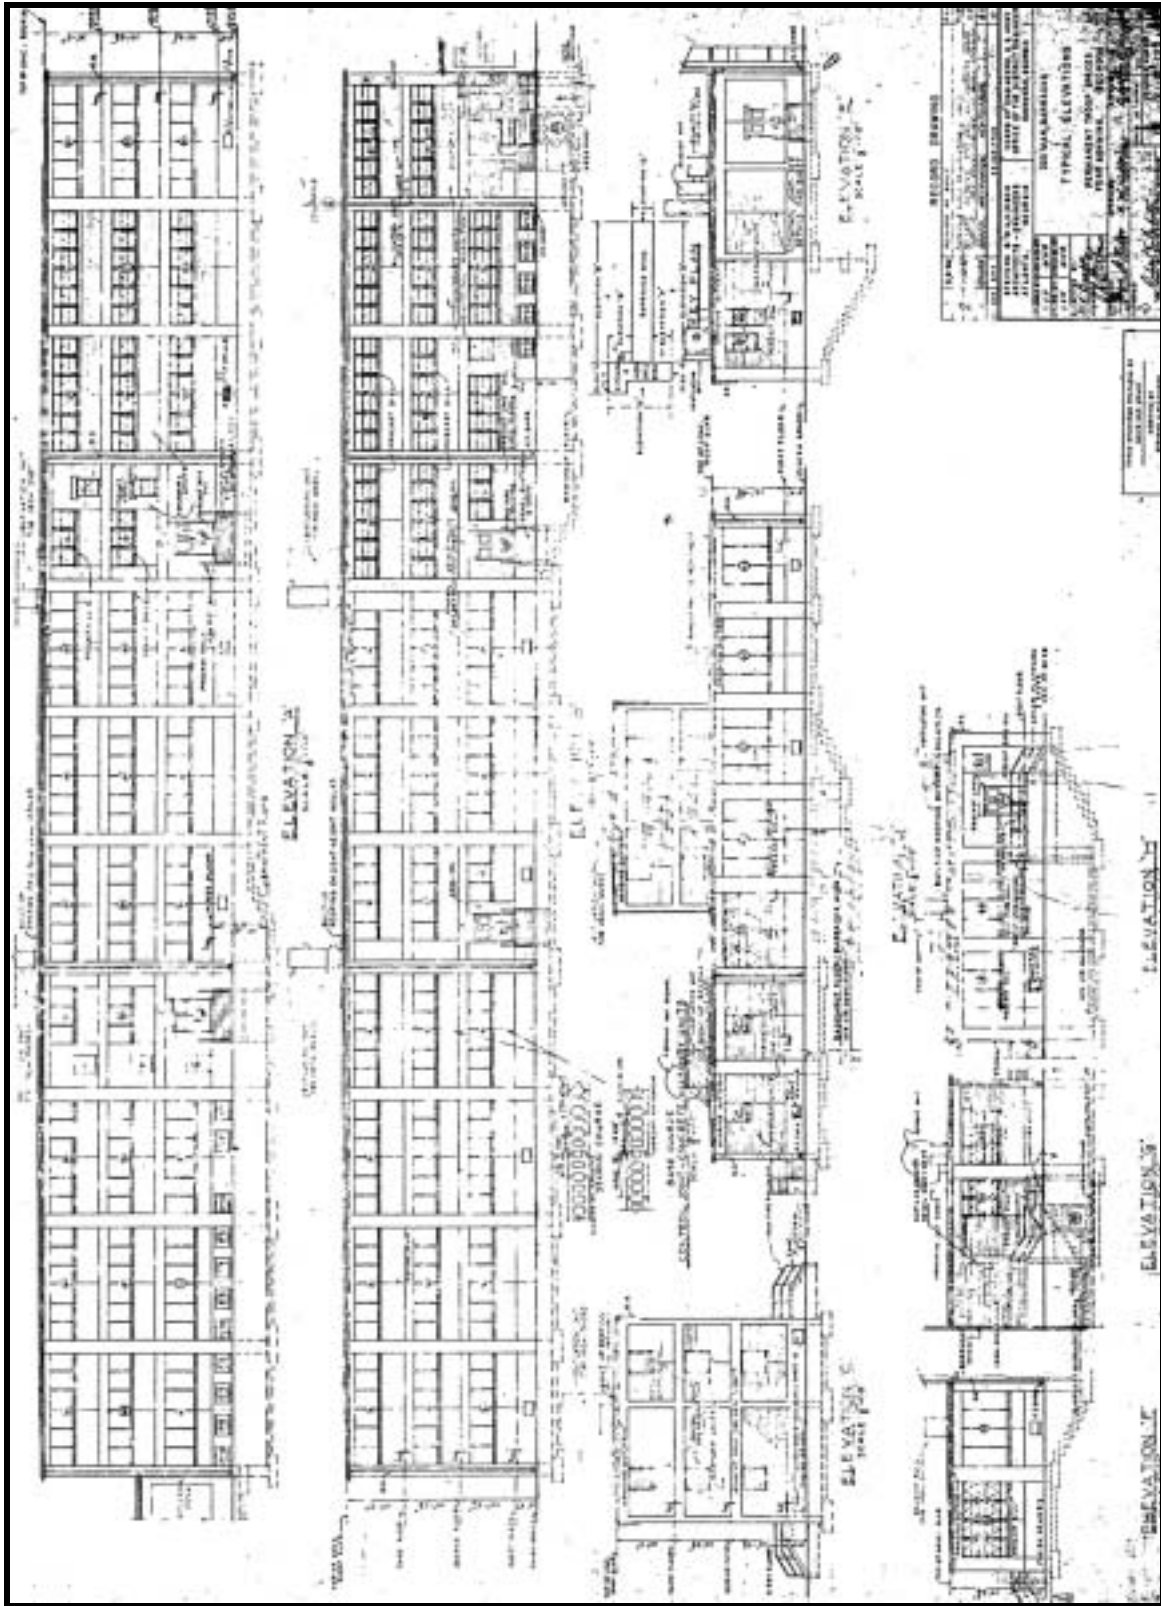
225-man hammerhead barracks, elevations (ca. 1951, revised 1954) (Engineering, Ft. Benning).
